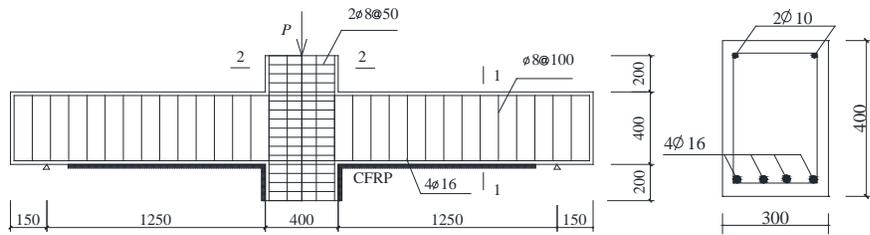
Dimensions and reinforcement arrangement of B1e, B2e, and B2i.
